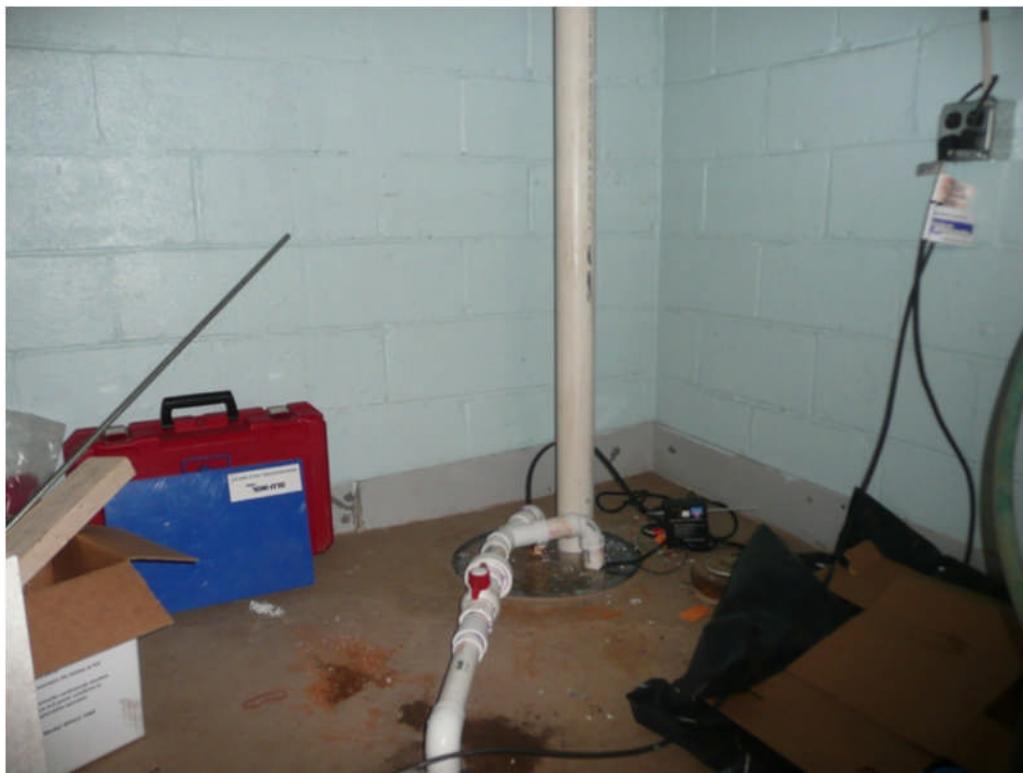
View of sump ventilation pipe and discharge to sanitary sewer drain.
